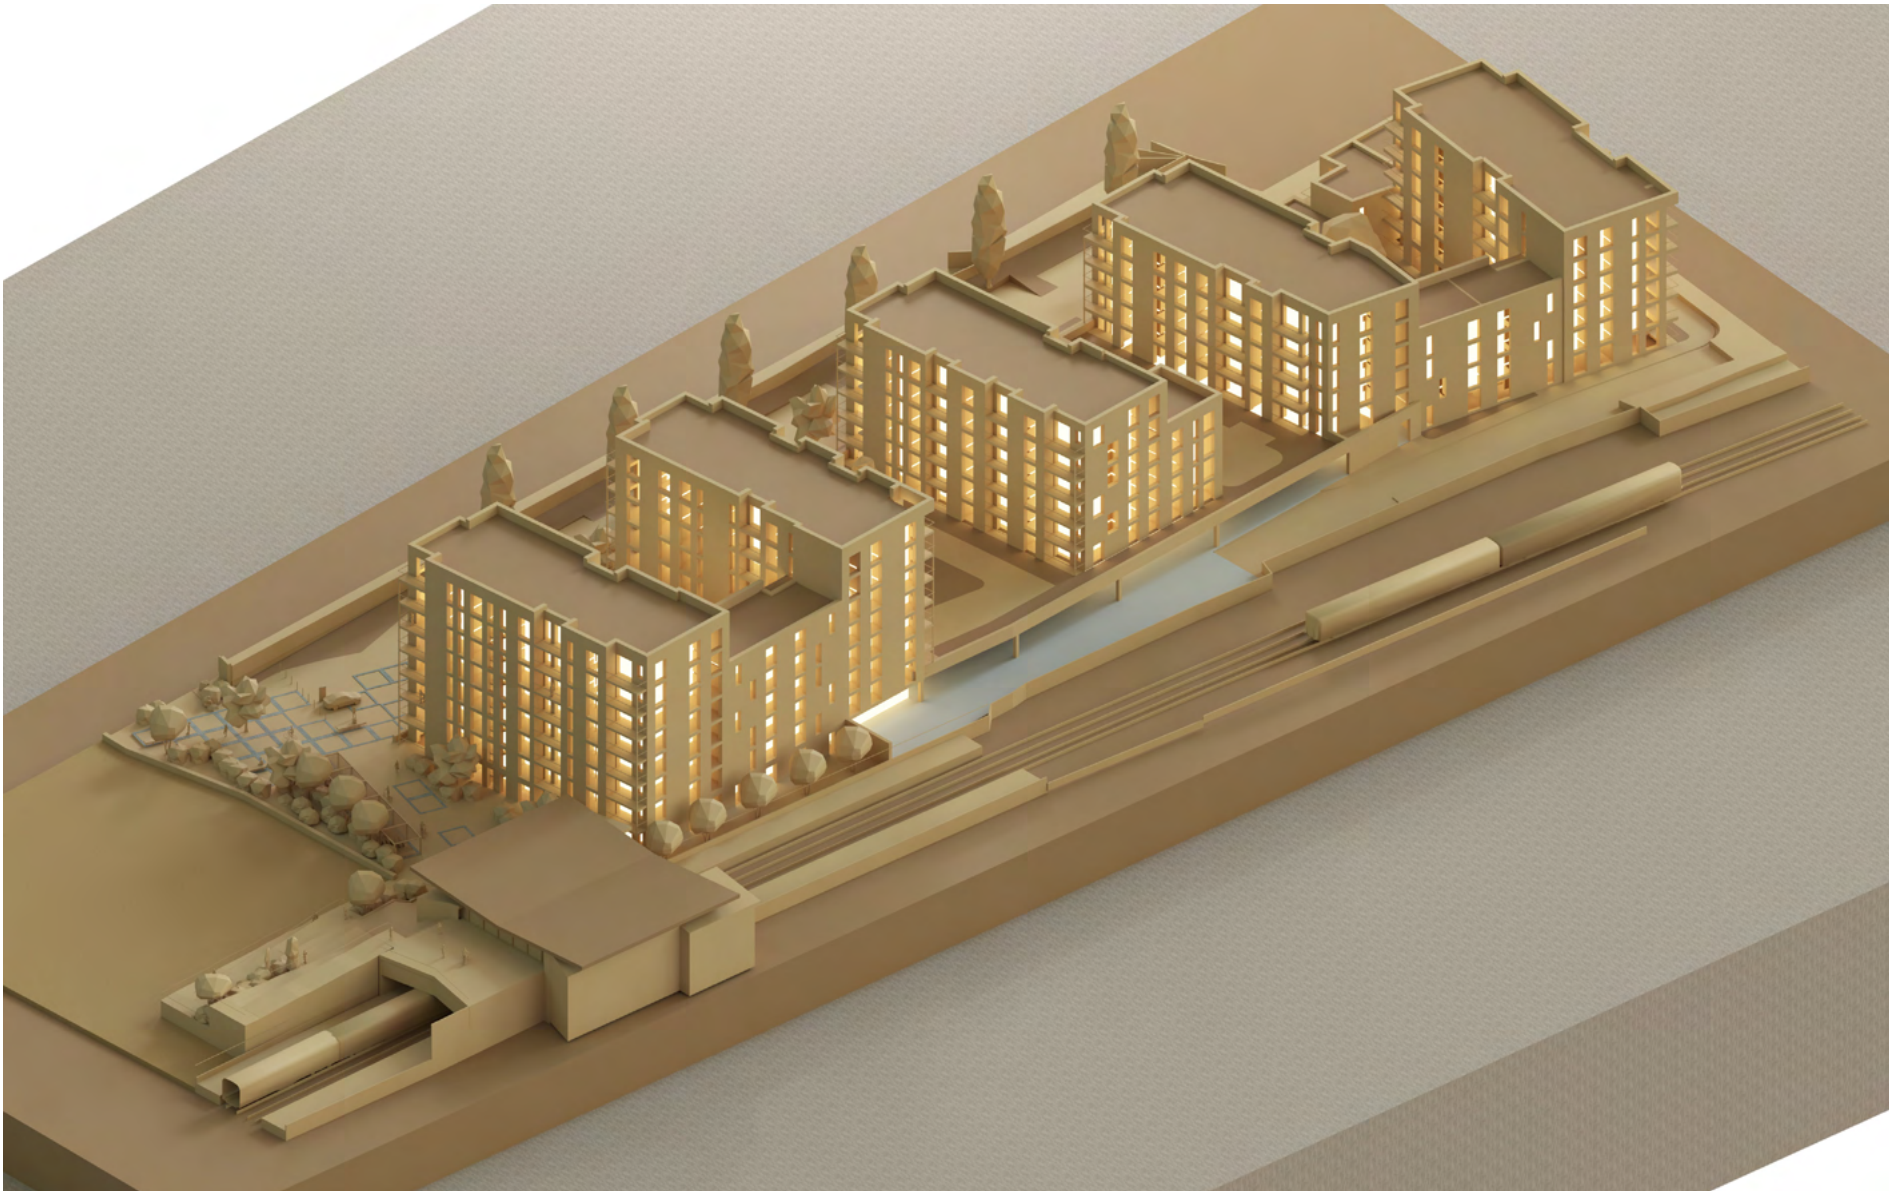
Model of Railway Quarter and Hansfield Station - View from North East [Hansfield Side]
